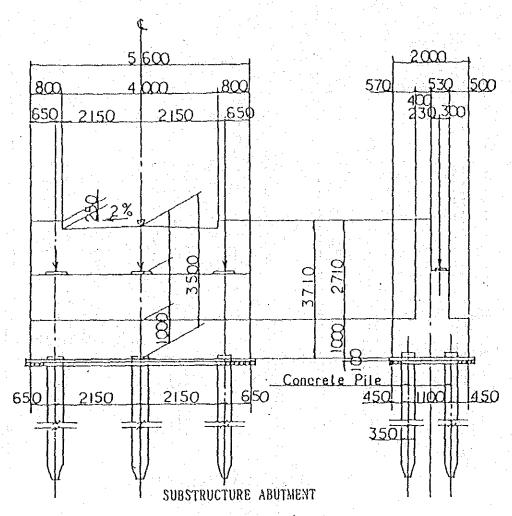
shows standard abutments and piers of bridges of Group I.
